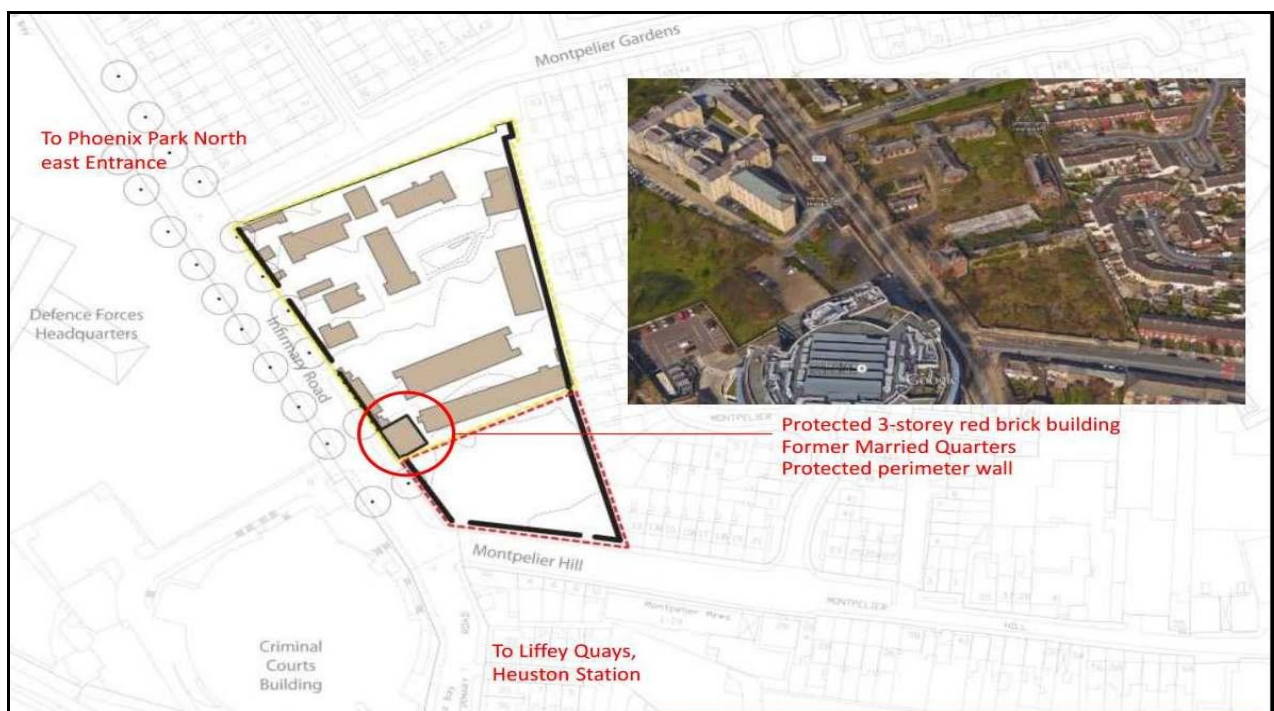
Infirmary Road Site(s) Phase 1 (Southern end) & Phase 2 (with existing structures)
